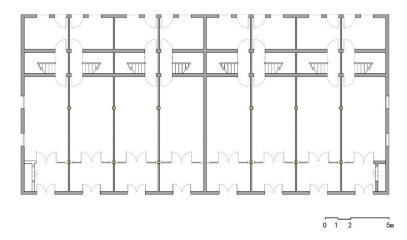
The first floor plan of the No. 1 Building of "Tianbaoli".
